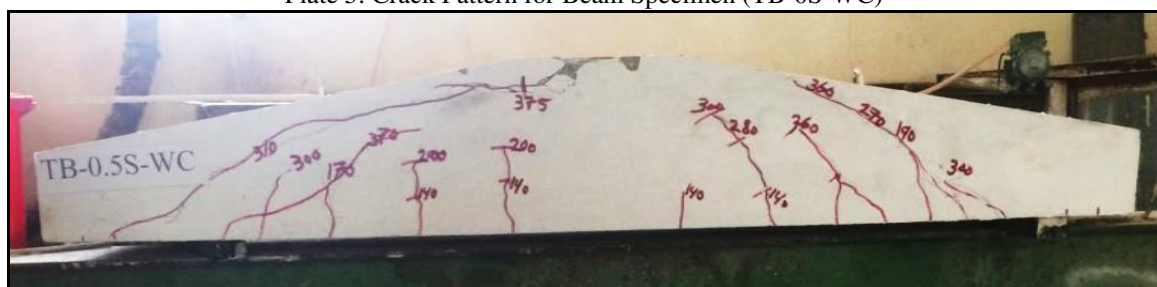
Crack Pattern for Beam Specimen (TB-0.5S-WC)
